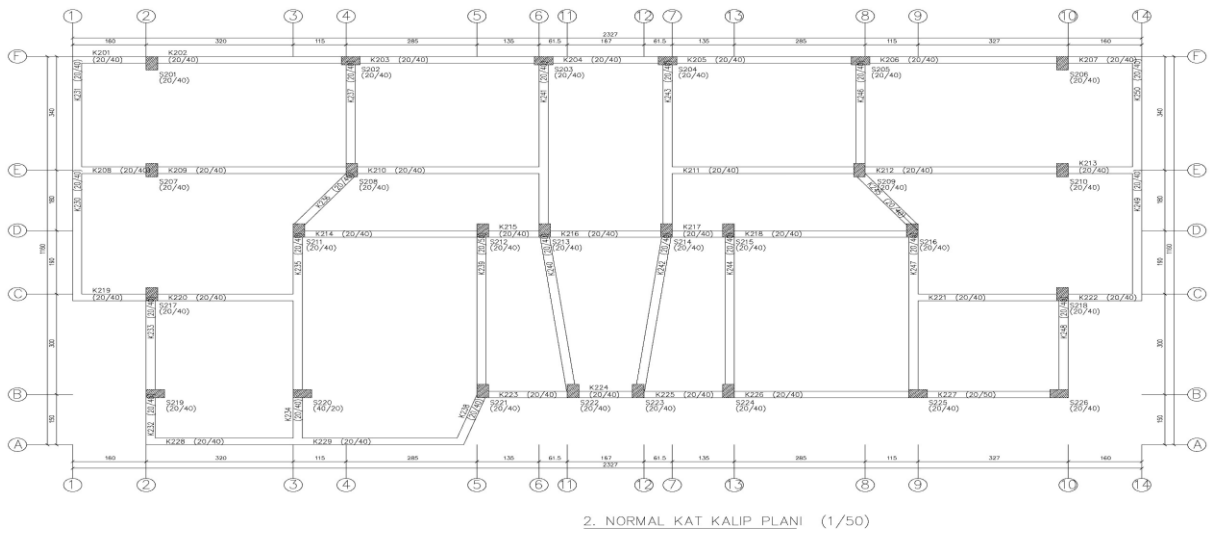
Typical Floor Plan of the Existing Condition of the Reinforced Building
